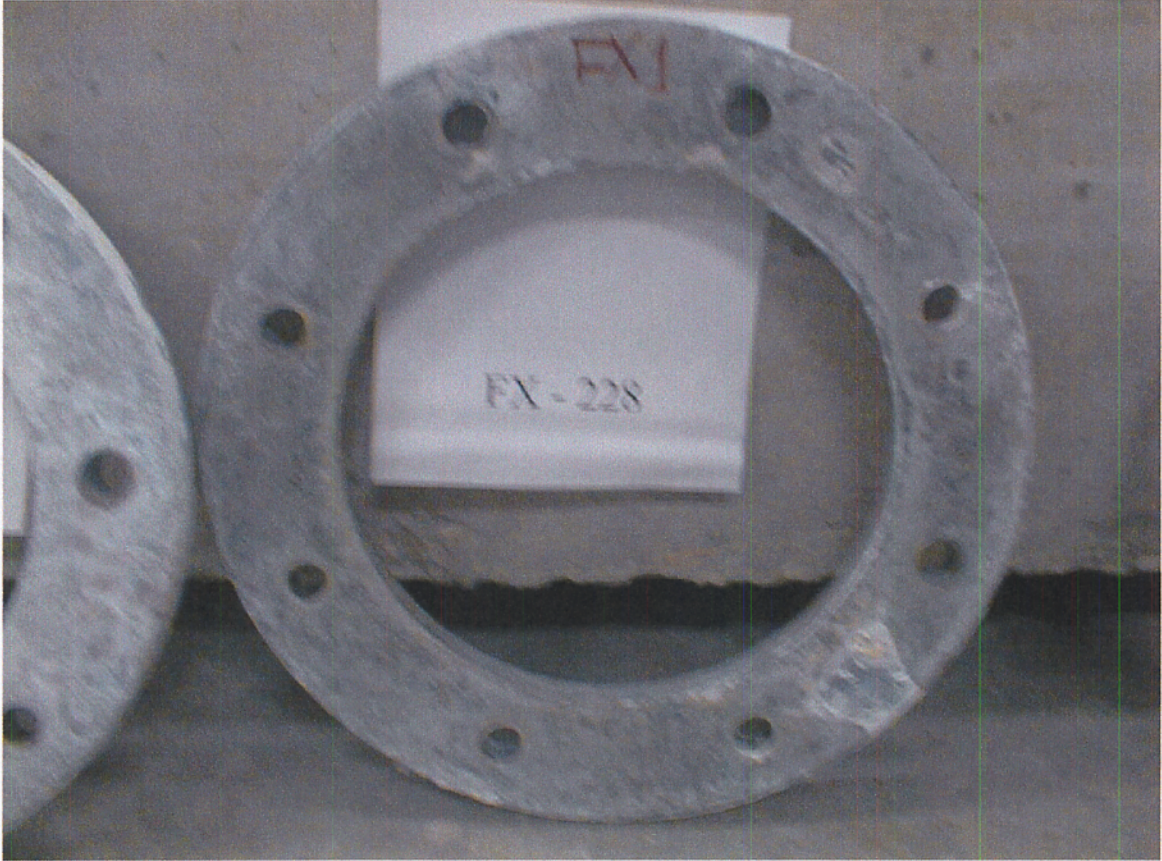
Galvanized Base Plate From Arrangement With Grout A As Grout Material For Grout Pad
